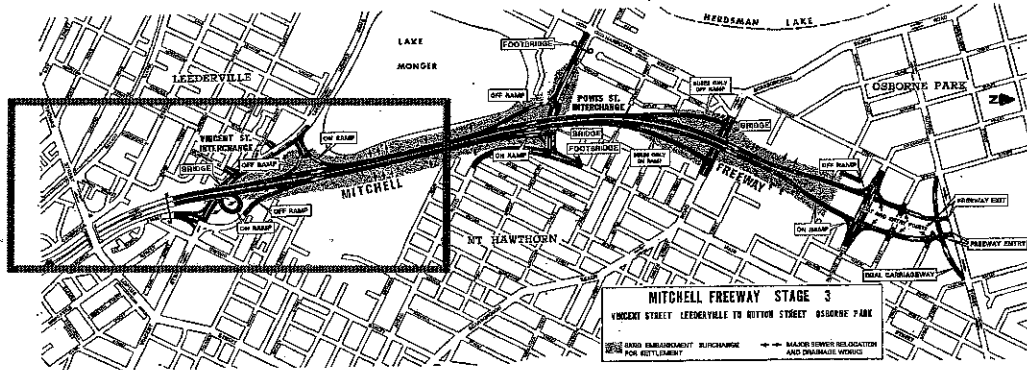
Main Roads Department Plan, Mitchell Freeway Stage 3: Vincent Street, Leederville to Hutton Street, Osborne Park.
